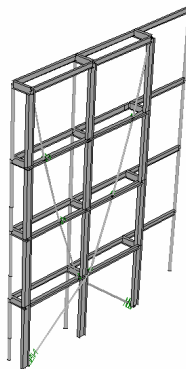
Cable Layout for CX3 and CX4 External Alignments in the Main Building
